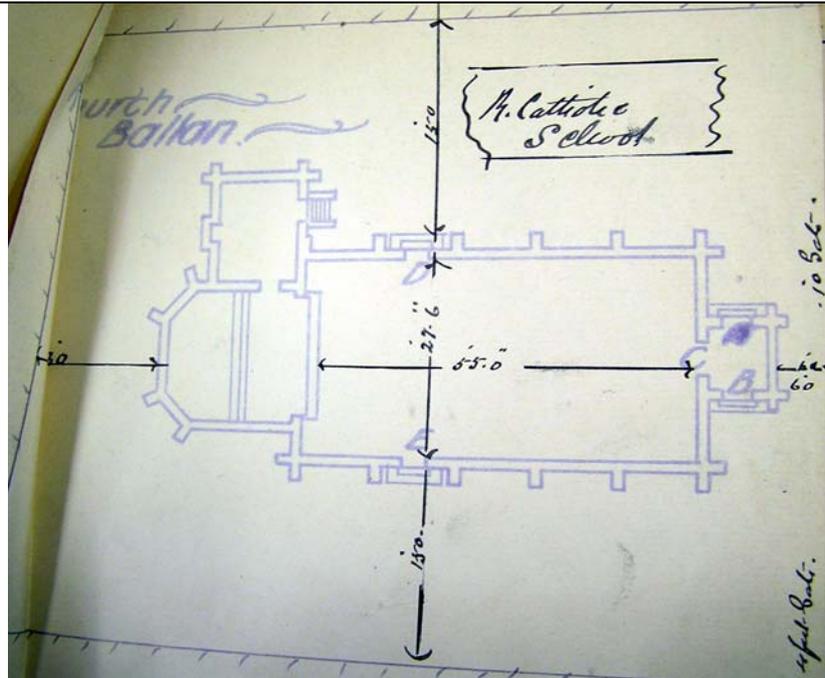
Board of Public Health, Floor Plan of St. Brigid's Church, n.d. [c.1913].
